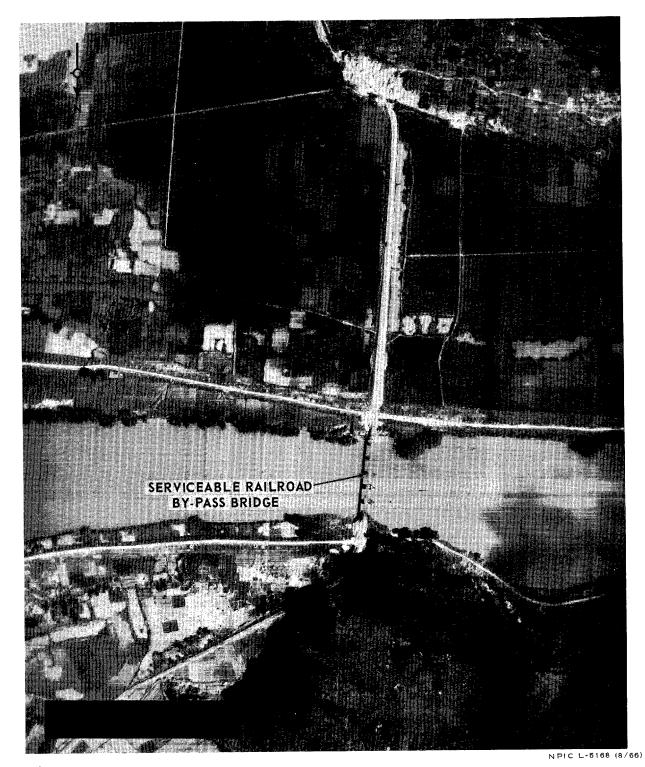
DONG PHONG THUONG RAILROAD BRIDGE SOUTH, HA NOI/THANH HOA RAIL LINE, NORTH VIETNAM
